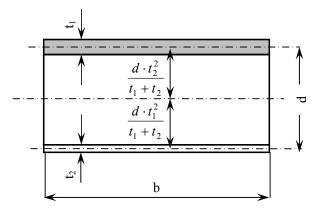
Dimensions in a cross section of an open sandwich beam with dissimilar skins
